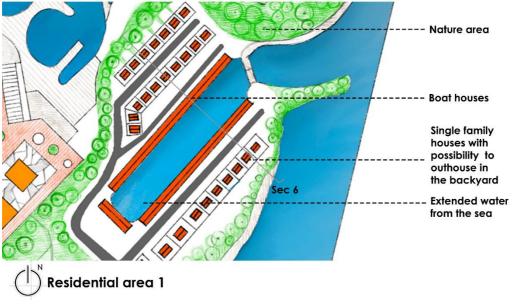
Zoom in plan of the boat house area, by Author (2021).
